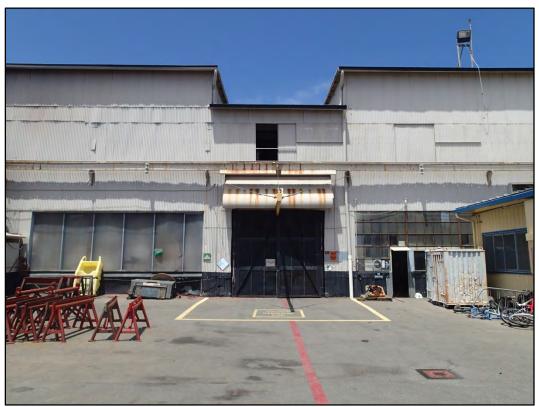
Overall south view of Building 109 Paint Shop.
